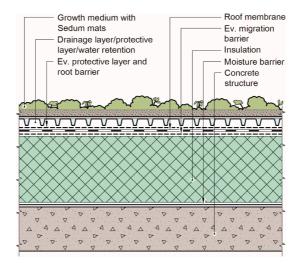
Example assembly of a blue-green roof mounted on a conventional, compact roof.
